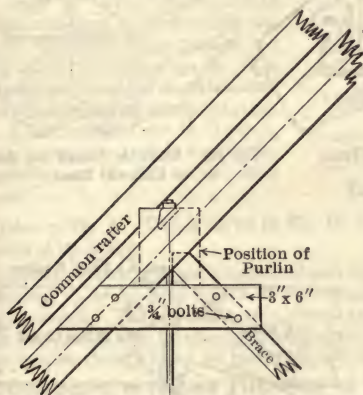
Detail of Joint 2, Fig. 1, with Rod Added
